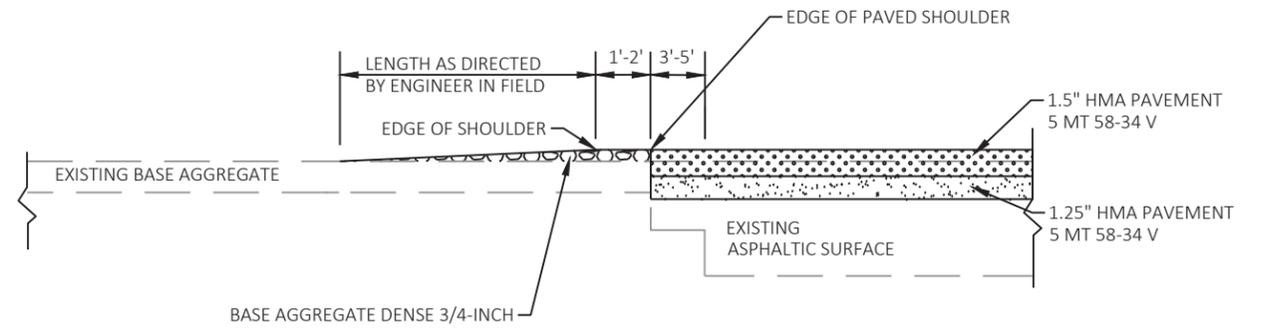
DETAIL FOR UNPAVED SIDE ROAD CONSTRUCTION JOINT
